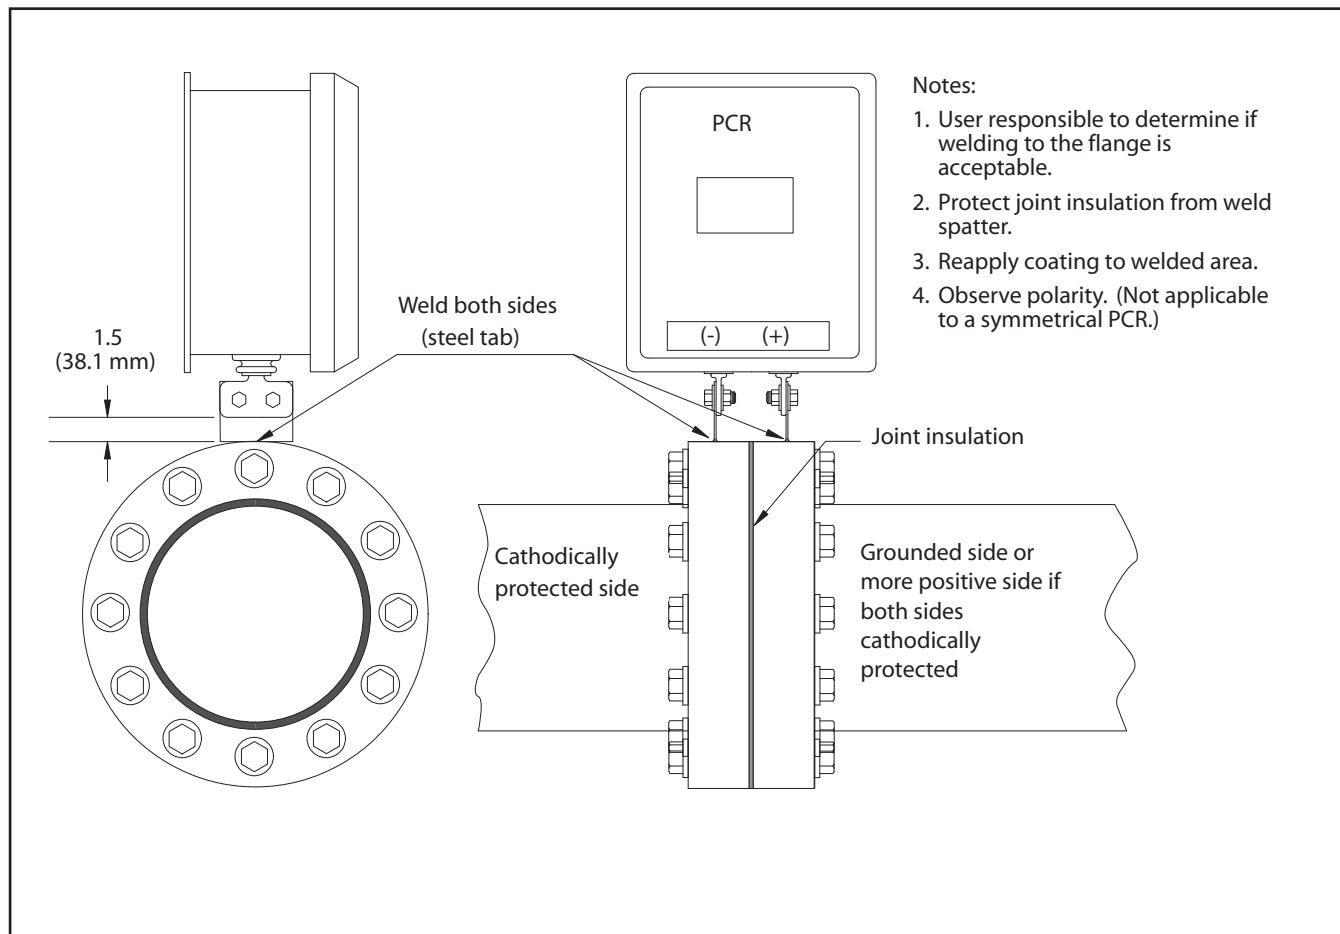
Typical Installation for Insulated Joint Protection
